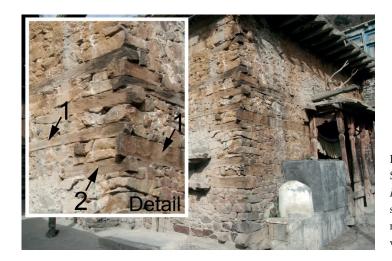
Ropa. Lotsāba Lhakhang. South-east corner. *Dhol-maide* construction. The detail shows a strengthening of the corners by supporting the *cheol* (1) with wooden beams (2).
